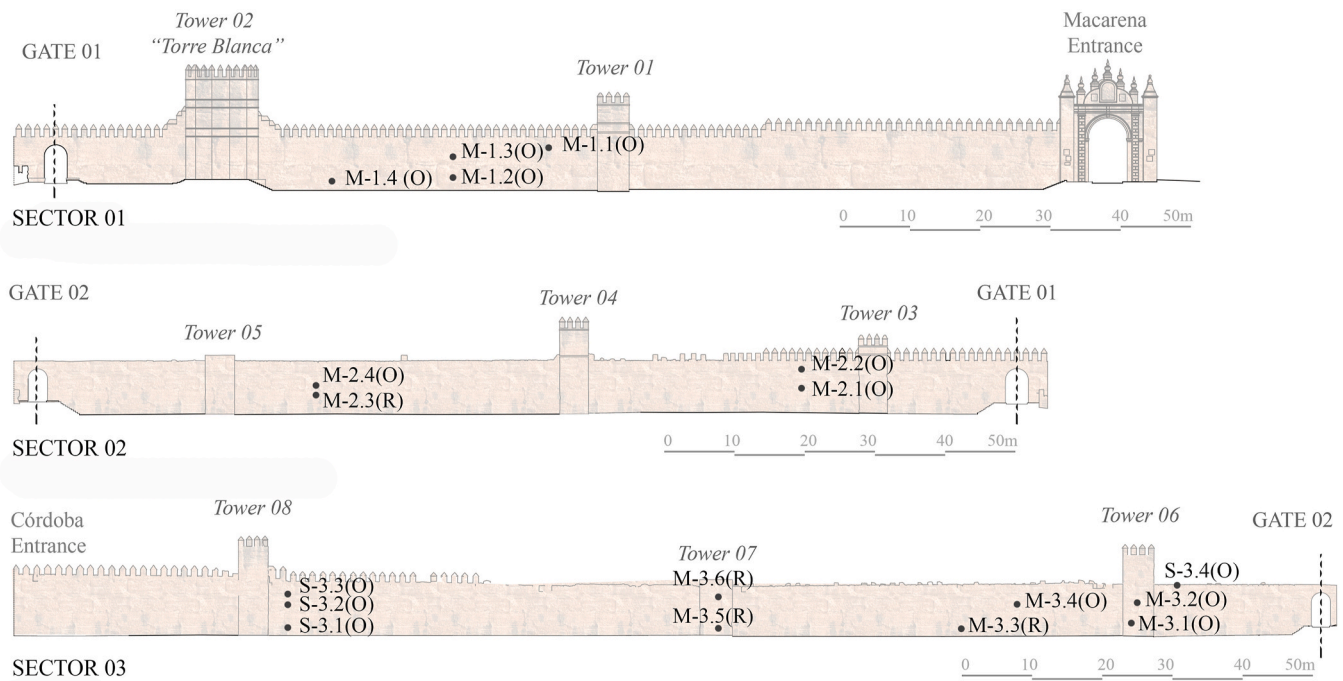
Extramural elevations of the Macarena Wall. Location of sampling and boreholes.
